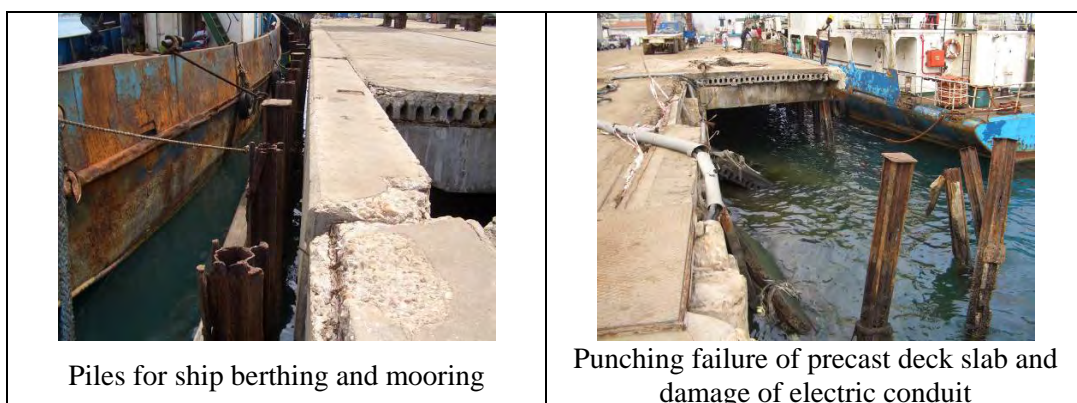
Damaged Condition of the Cabotage Terminal -2
